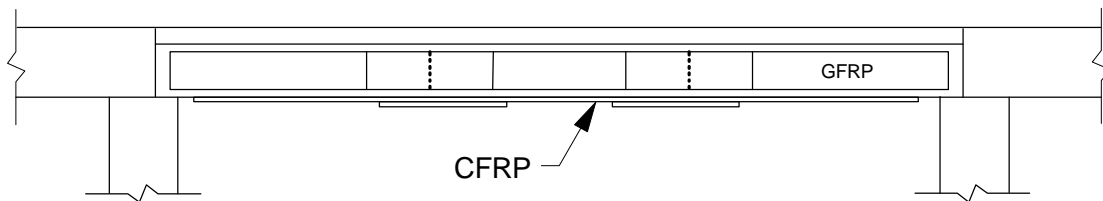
Typical Layout for CFRP and GFRP Laminates for Bridge Rehabilitation.
